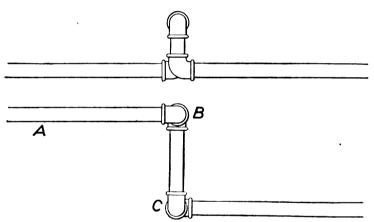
Elevation and Plan of Swivel-Joint to Counteract Effects of Expansion and Contraction in Pipes.
